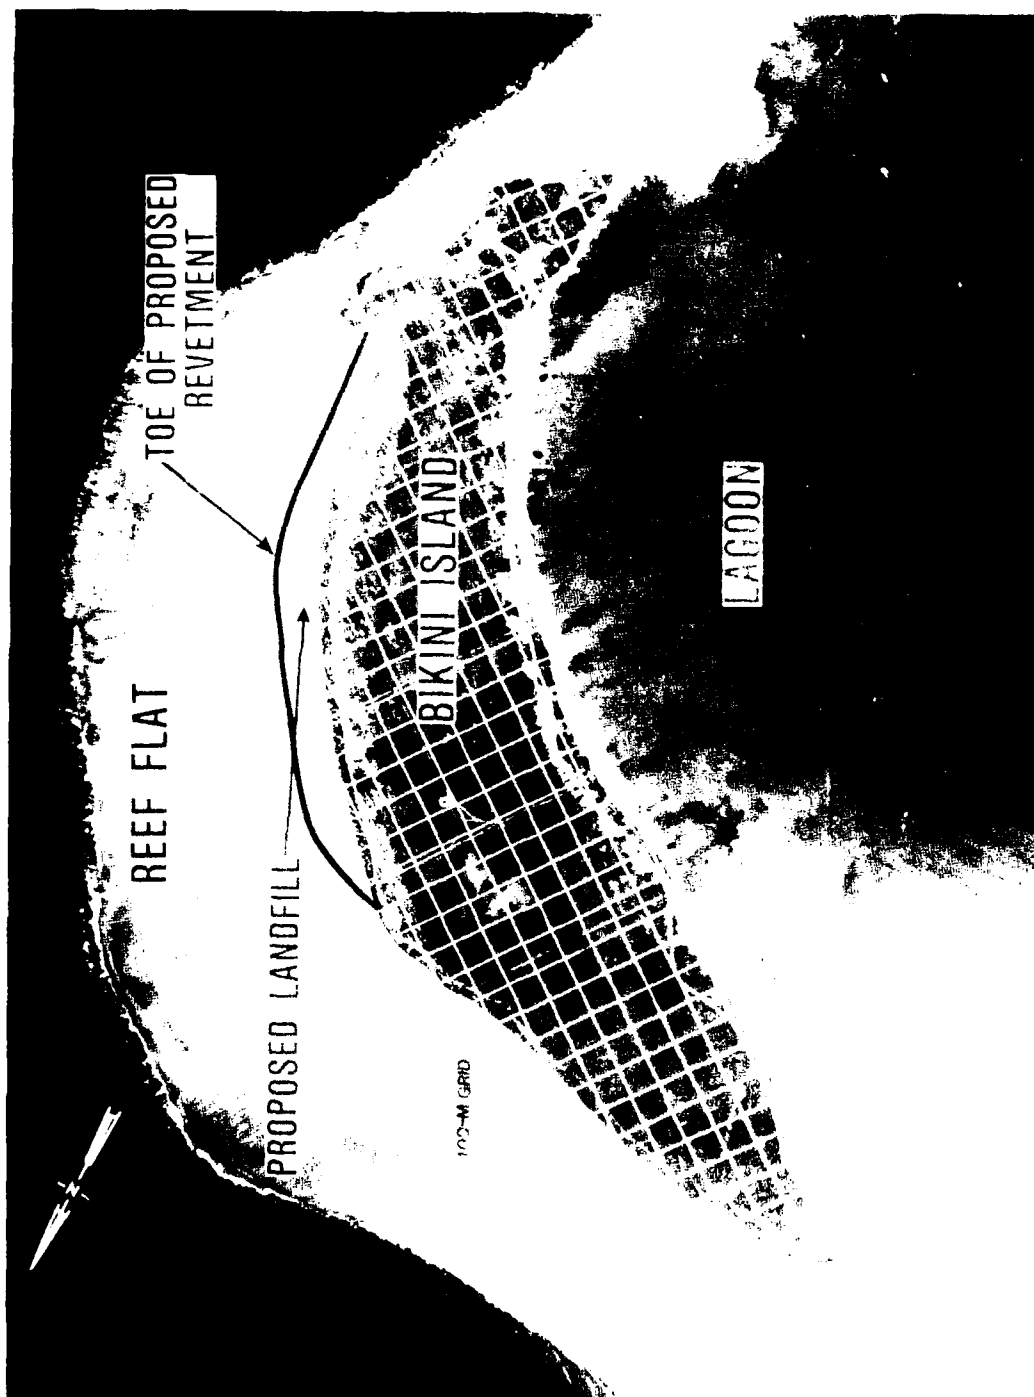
Landfill and revetment plan (grid lines are 100 m apart)
